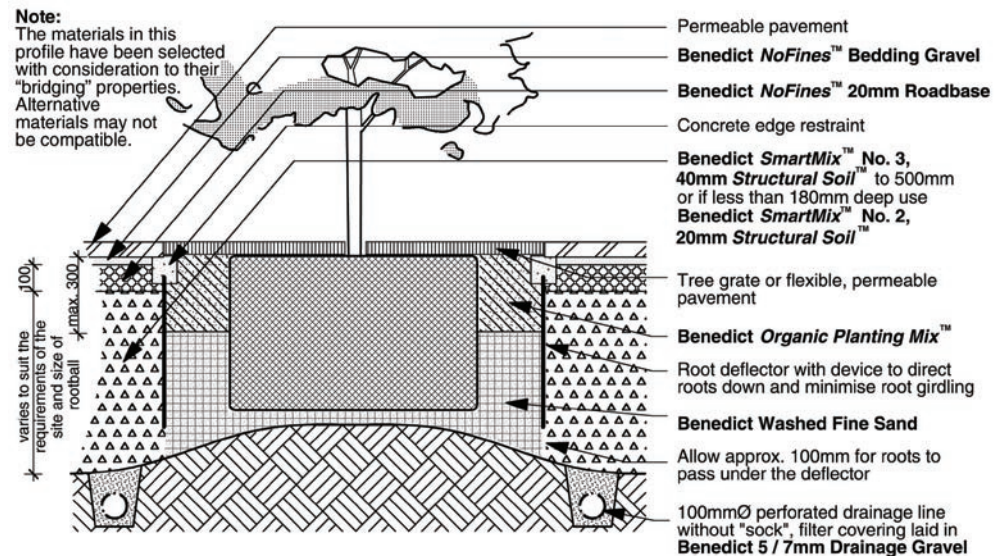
Figure I. Benedict *SmartMix*™ Permeable Pavement Profile for new tree installation
